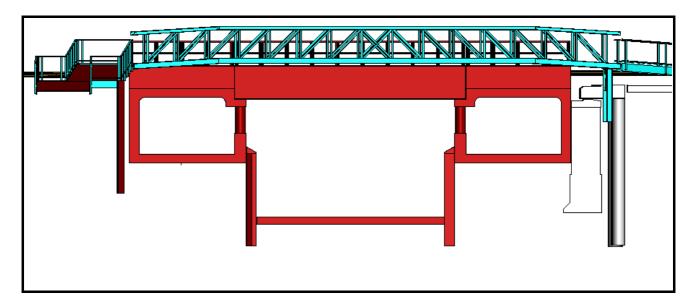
Botley Road East Elevation (Bridge elements only shown for clarity)
